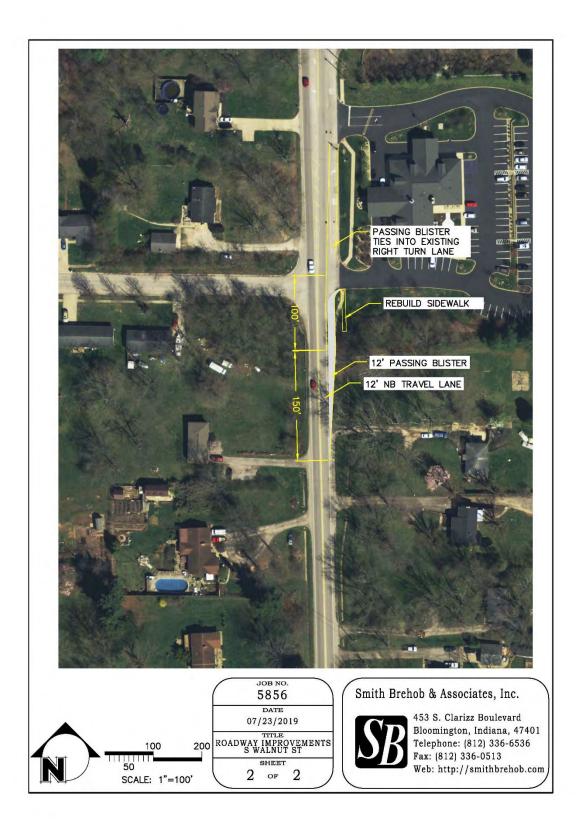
EXHIBIT EIGHT: Highway Department Road Improvement Requests
